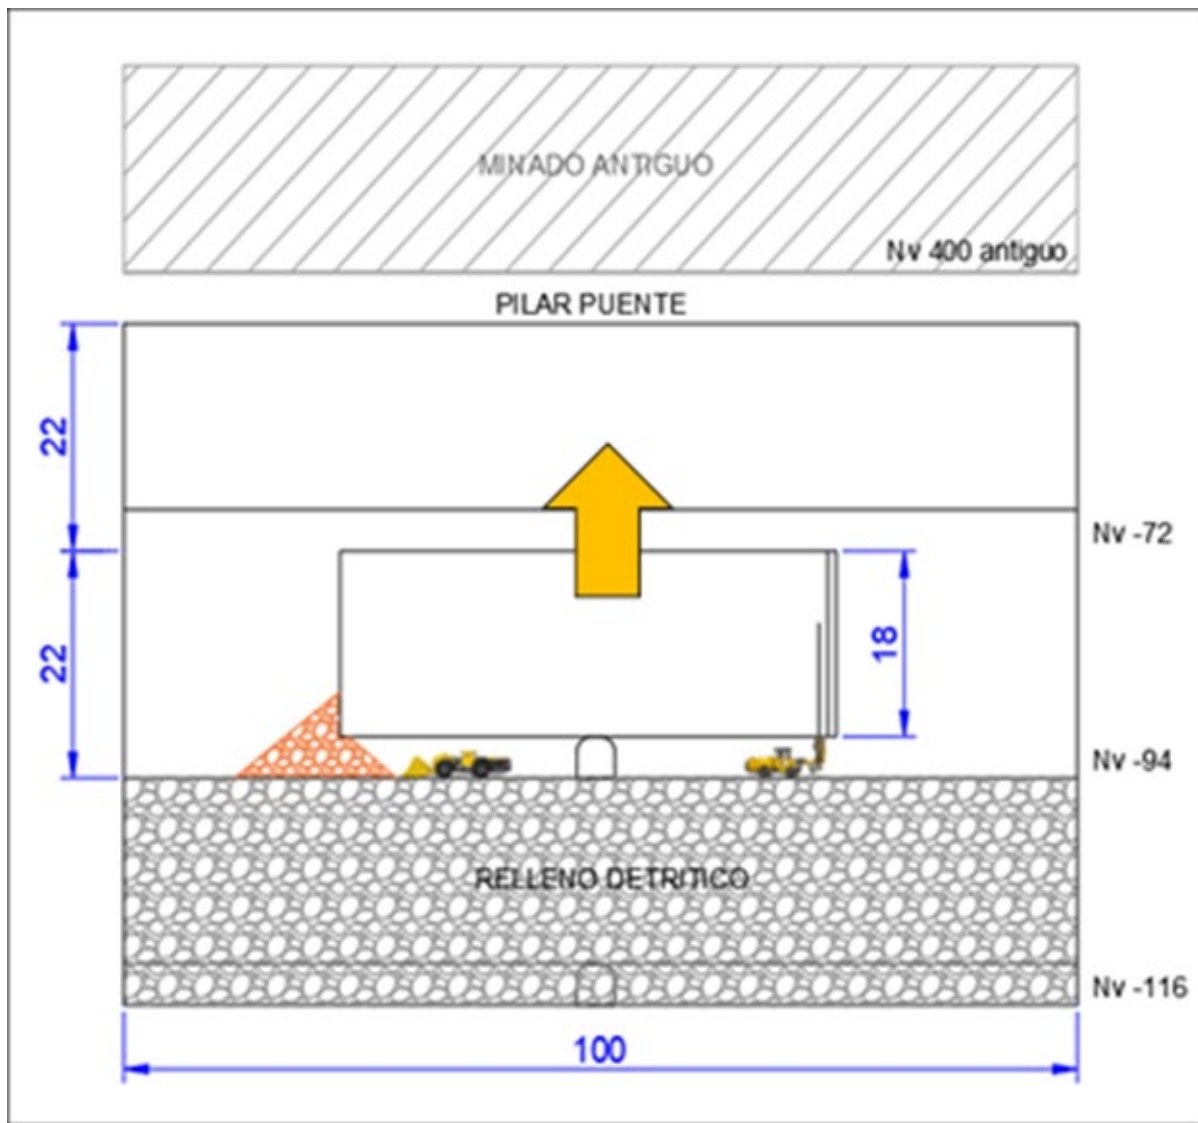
Longitudinal Retreat Sublevel Stoping with Delayed Backfilling
